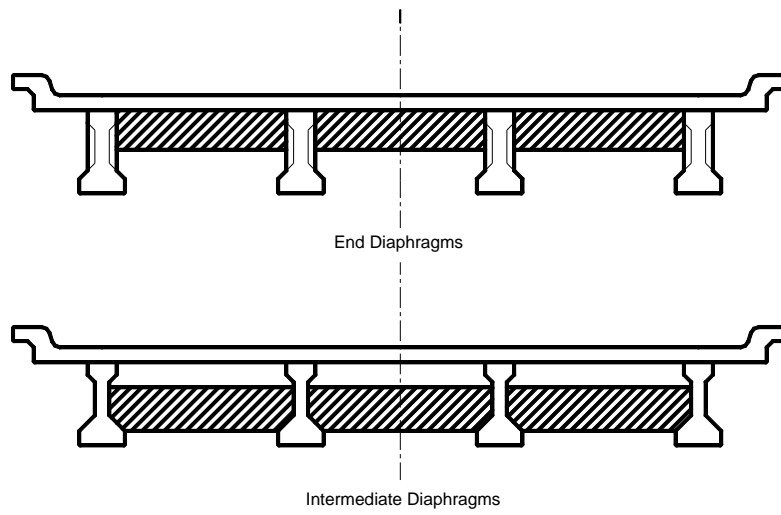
Diaphragm Layout – Chandler Creek Bridge – 40’ Span
